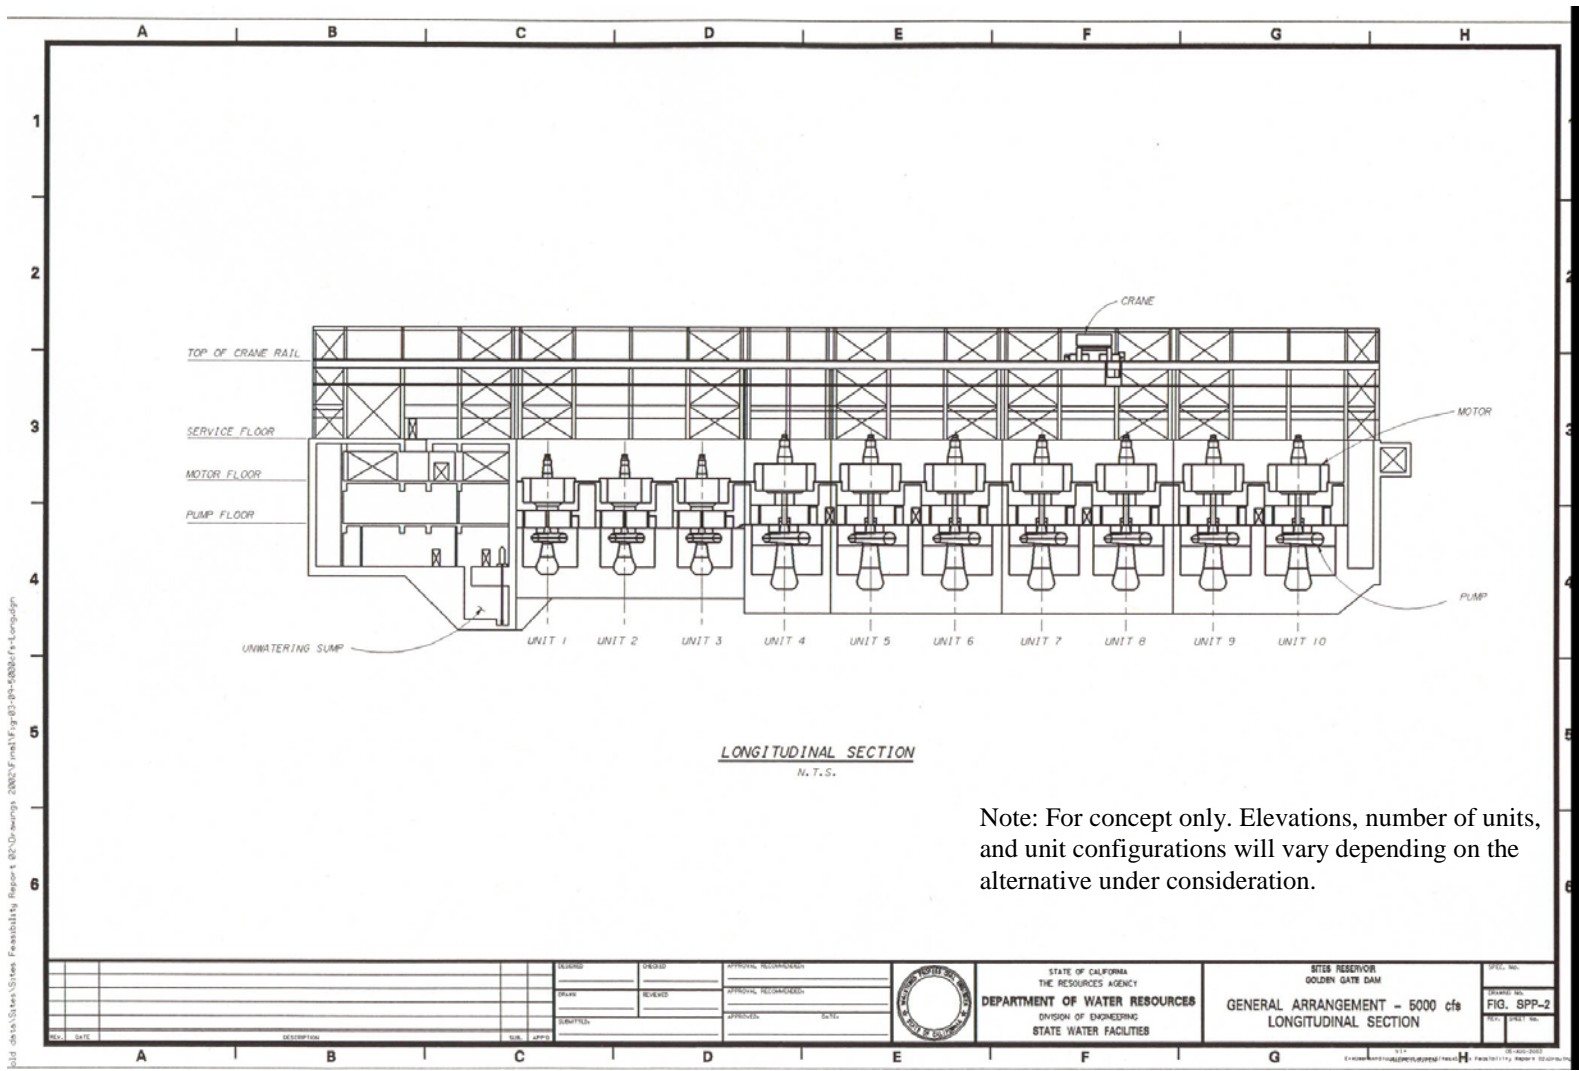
Sites Pumping/Generating Plant – Q=5,900 cfs – Longitudinal Section
